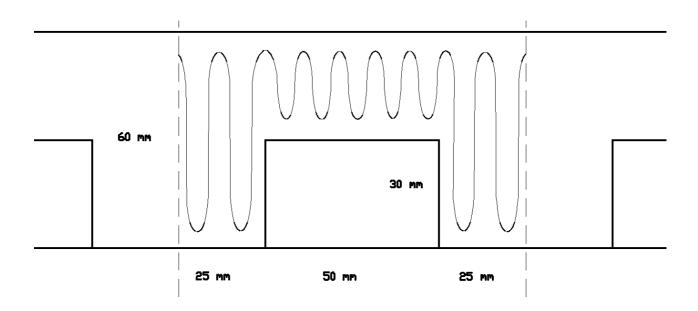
Section of lowest insulation panel in dryable roofing insulation system
